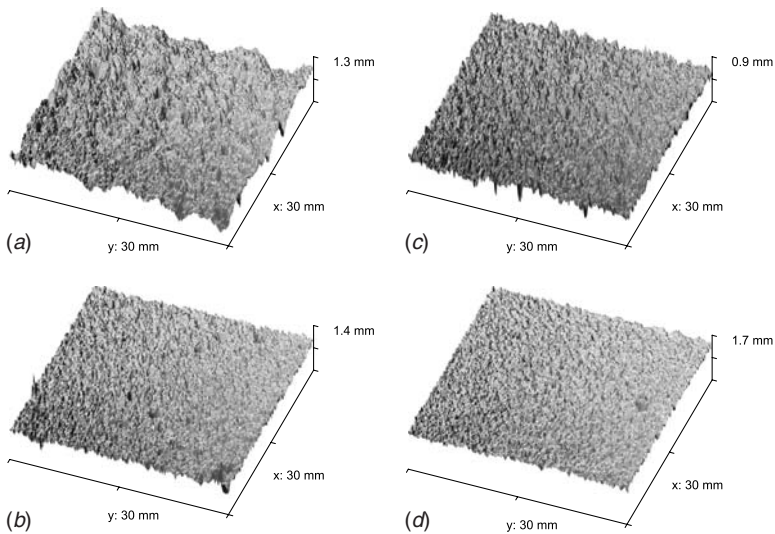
Surface structures of UHPC specimens after pretreatment. (a) Sandblasted, (b) ground, (c) retarding agent, and (d) non-modified formwork surface.
